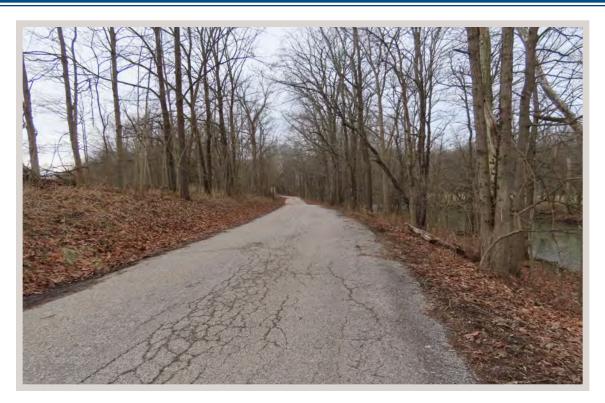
Looking southwest along Cement Plant Road towards the southern project terminus.
